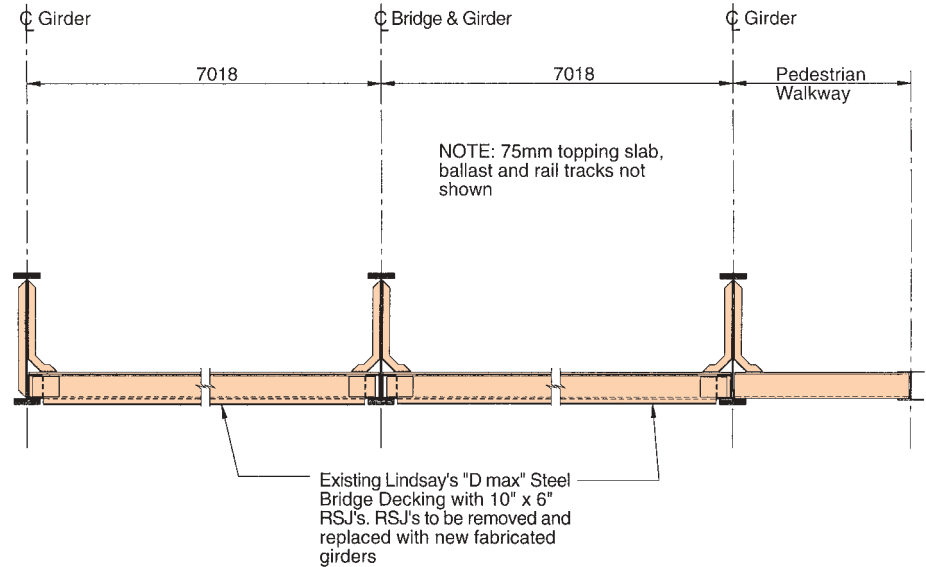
Figure A RUSSELL STREET BRIDGE CROSS-SECTION
